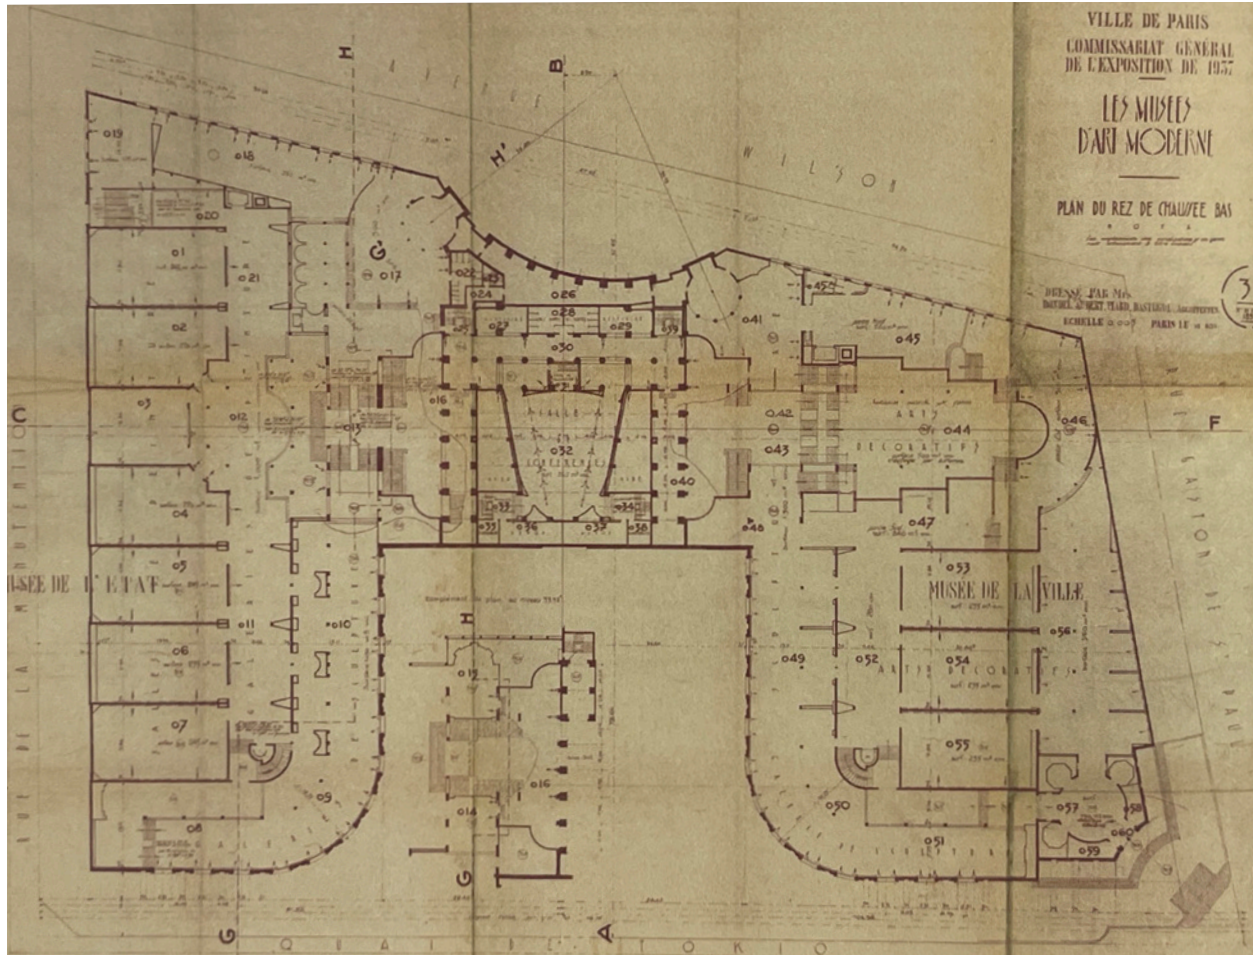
Dondel & Aubert, Ground Floor Plan, Palais de Tokyo, Paris, France, 1937.
